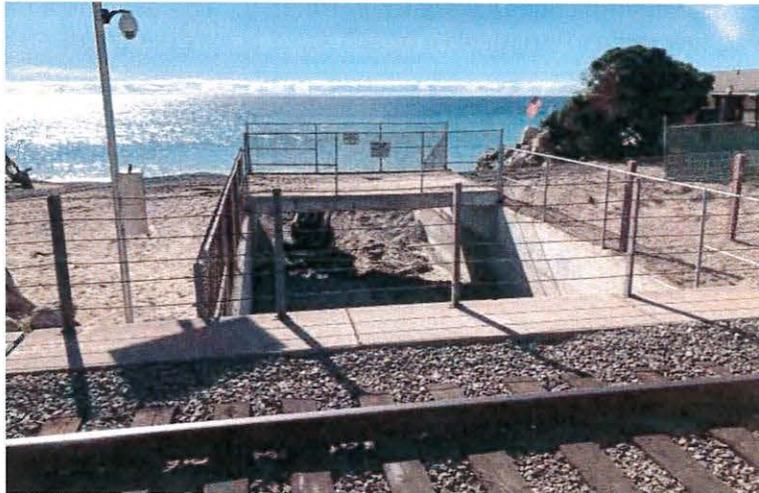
Segunda Deshecha Cañada Channel Outlet
